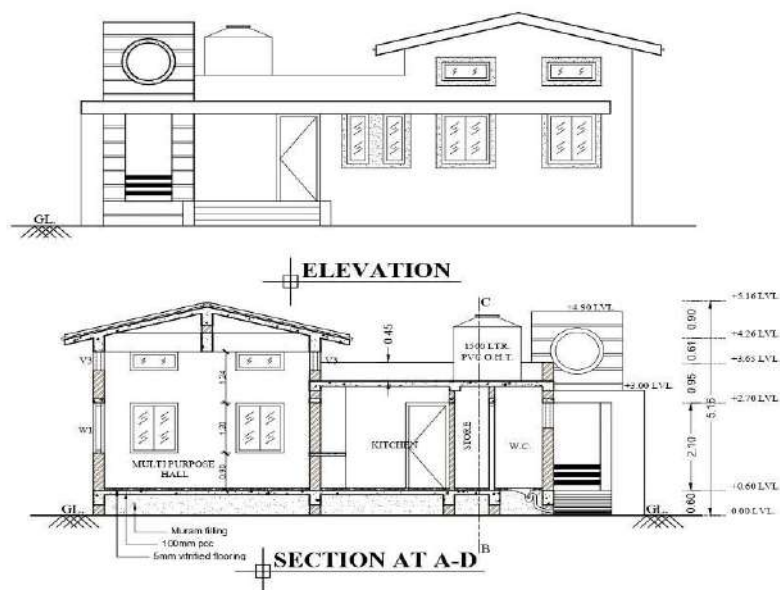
Anganwadi Elevation &amp; Section
